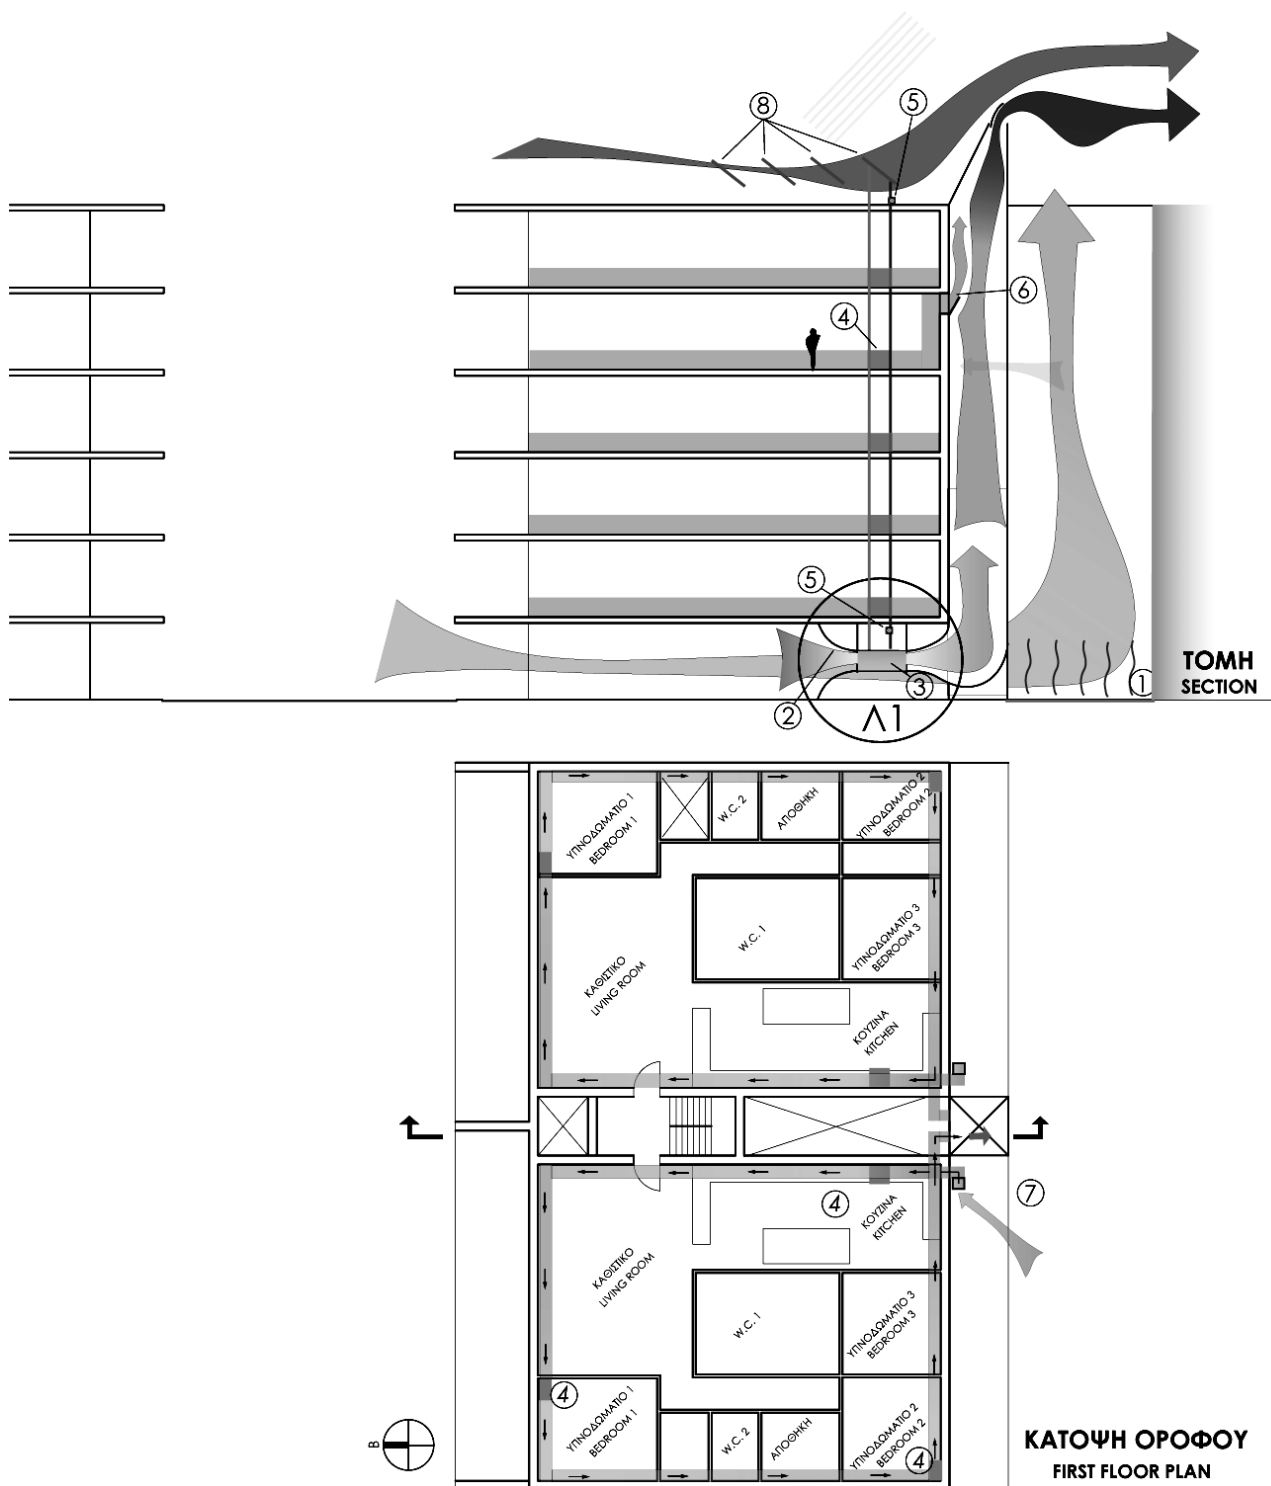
Section and floor plans of the building and the bioclimatic air conditioning system.
